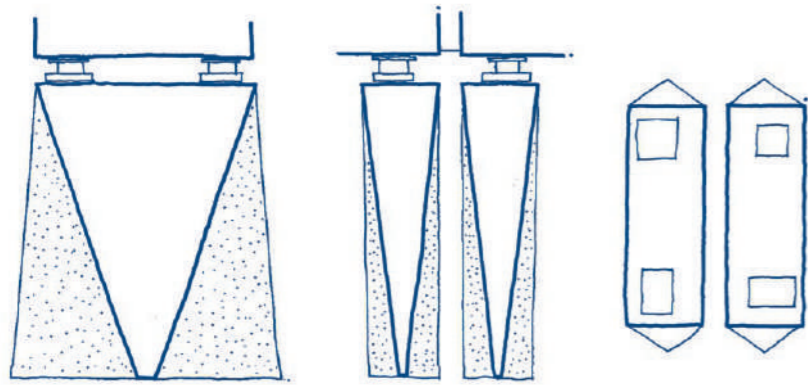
\_ Sketch - Expansion portal pier elevations and plan view
